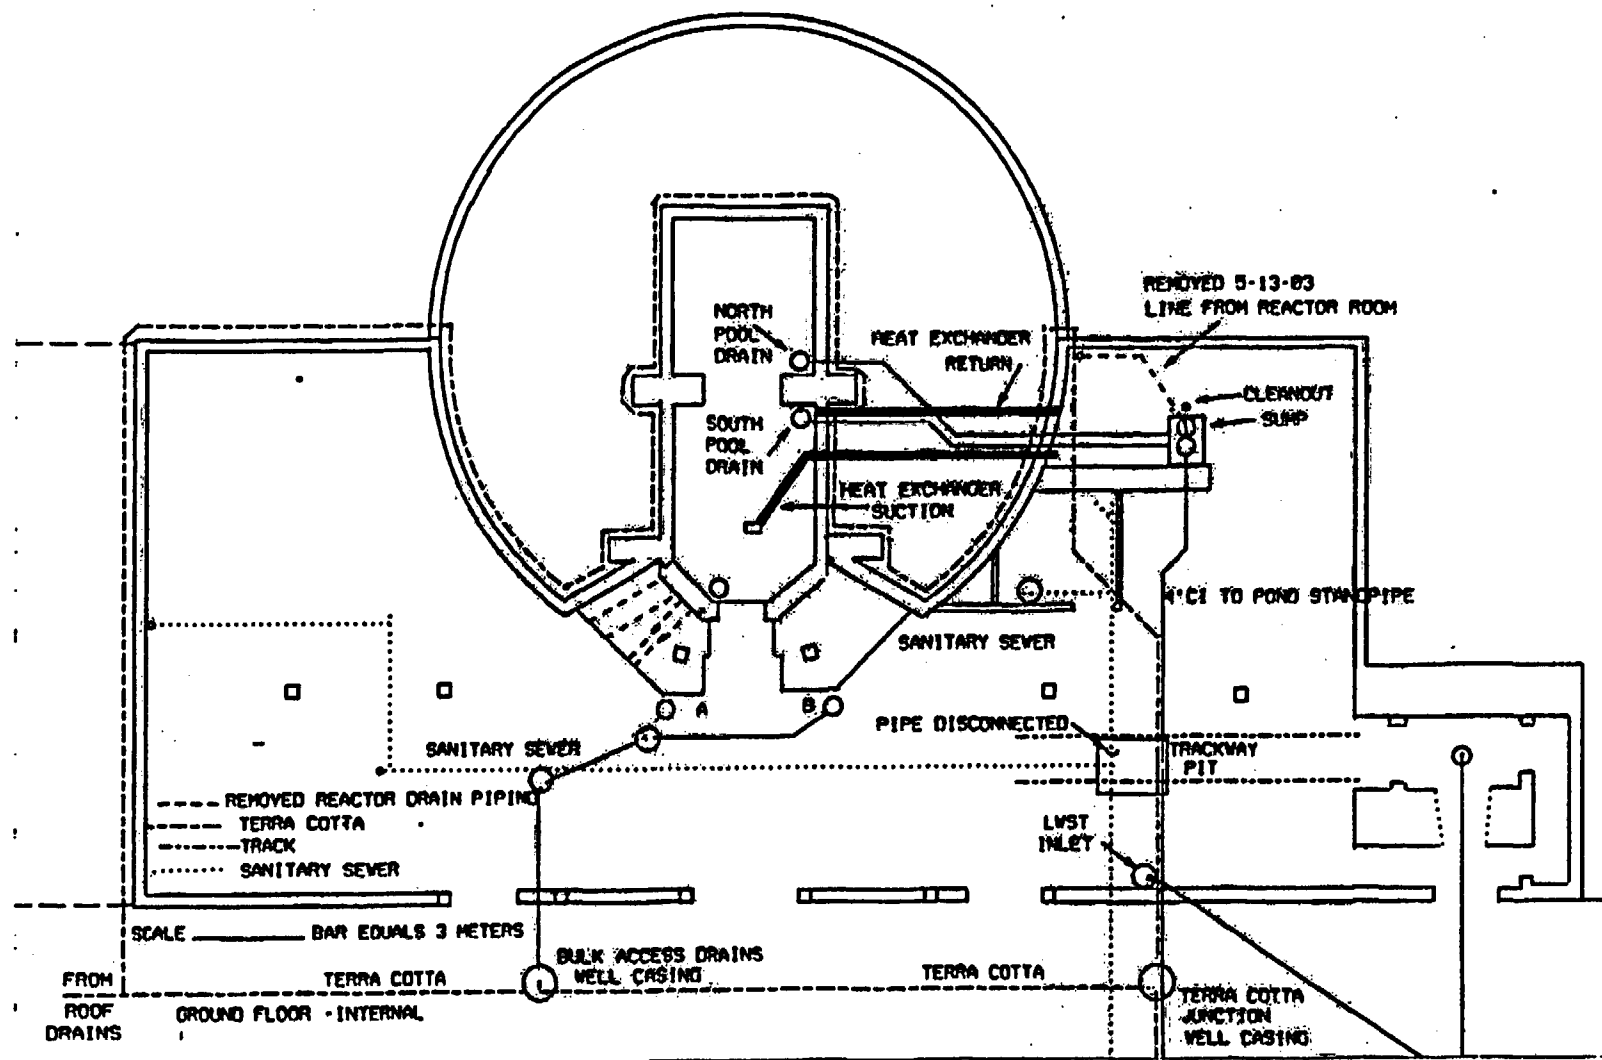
Ground Floor Indicating Remaining Drain Piping.
